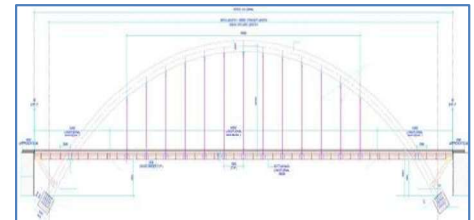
## DETAIL DESIGN OF FOUNDATION ANALYSIS & BRIDGE DESIGN
